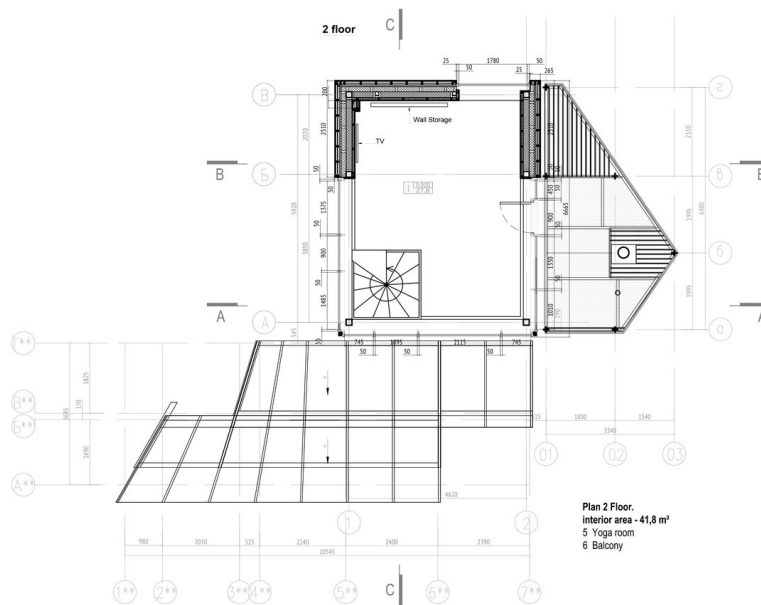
Plans of Building(<https://www.archdaily.com/806618/the-sports-pavilion-horomystudio/58bc355ee58ecedd000014d-the-sports-pavilion-horomystudio-roof-plan>)
